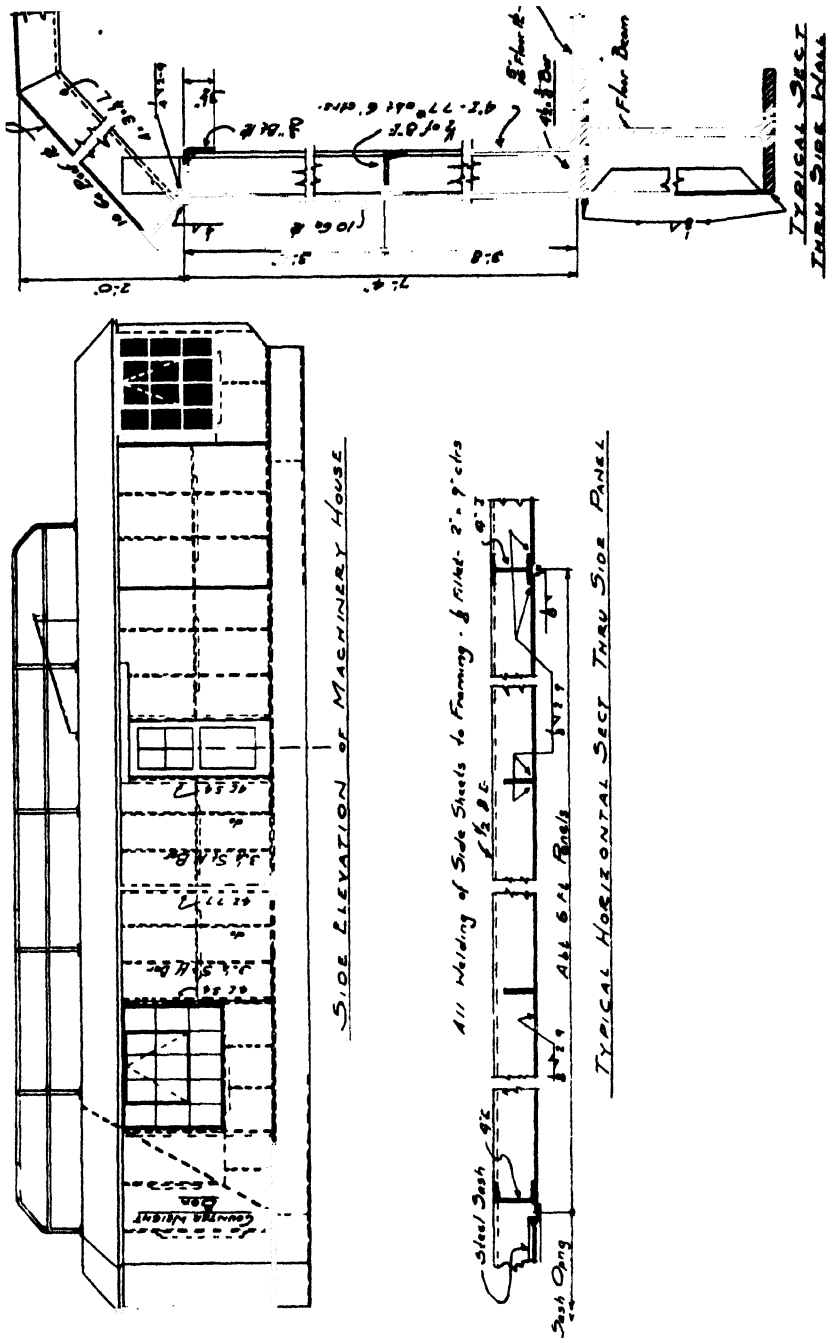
Side elevation of machine house, typical section through side panel and typical section through side wall.
